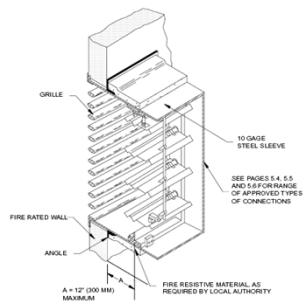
FIRE DAMPER OUT OF WALL
